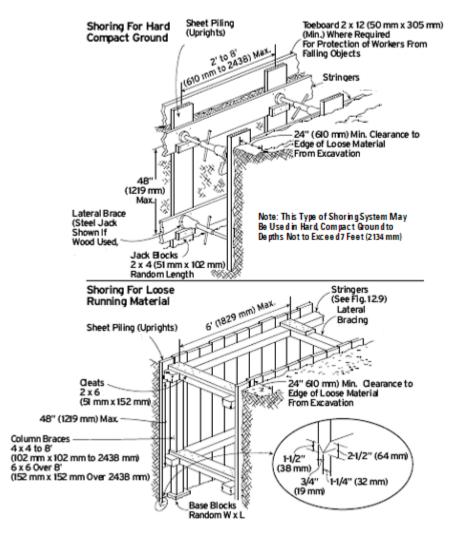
Typical shoring and bracing systems for excavations. (ref. Chevron Safety in Design Manual)
